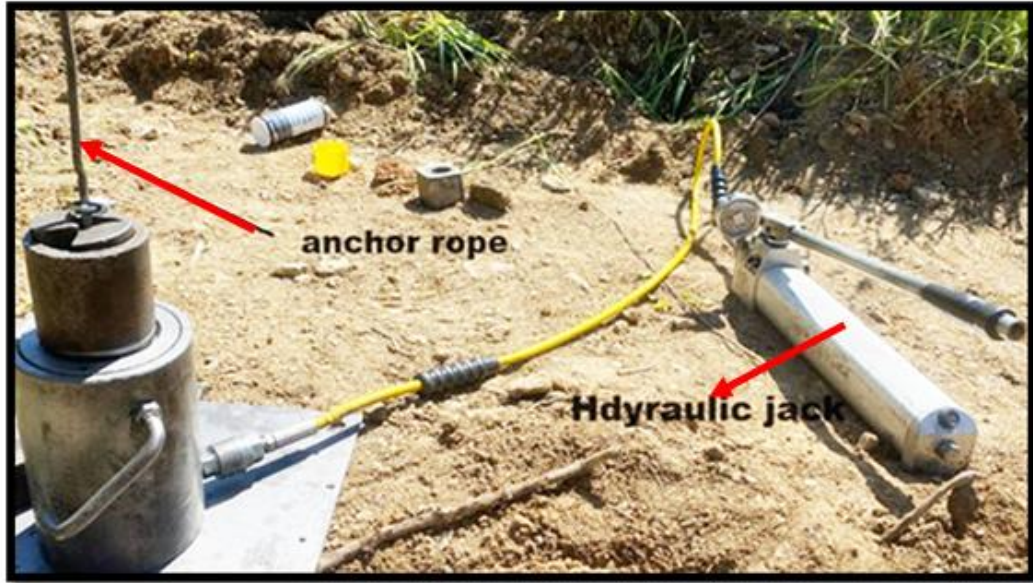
The pull-out test performed to FPA-I anchor by a hydraulic jack
